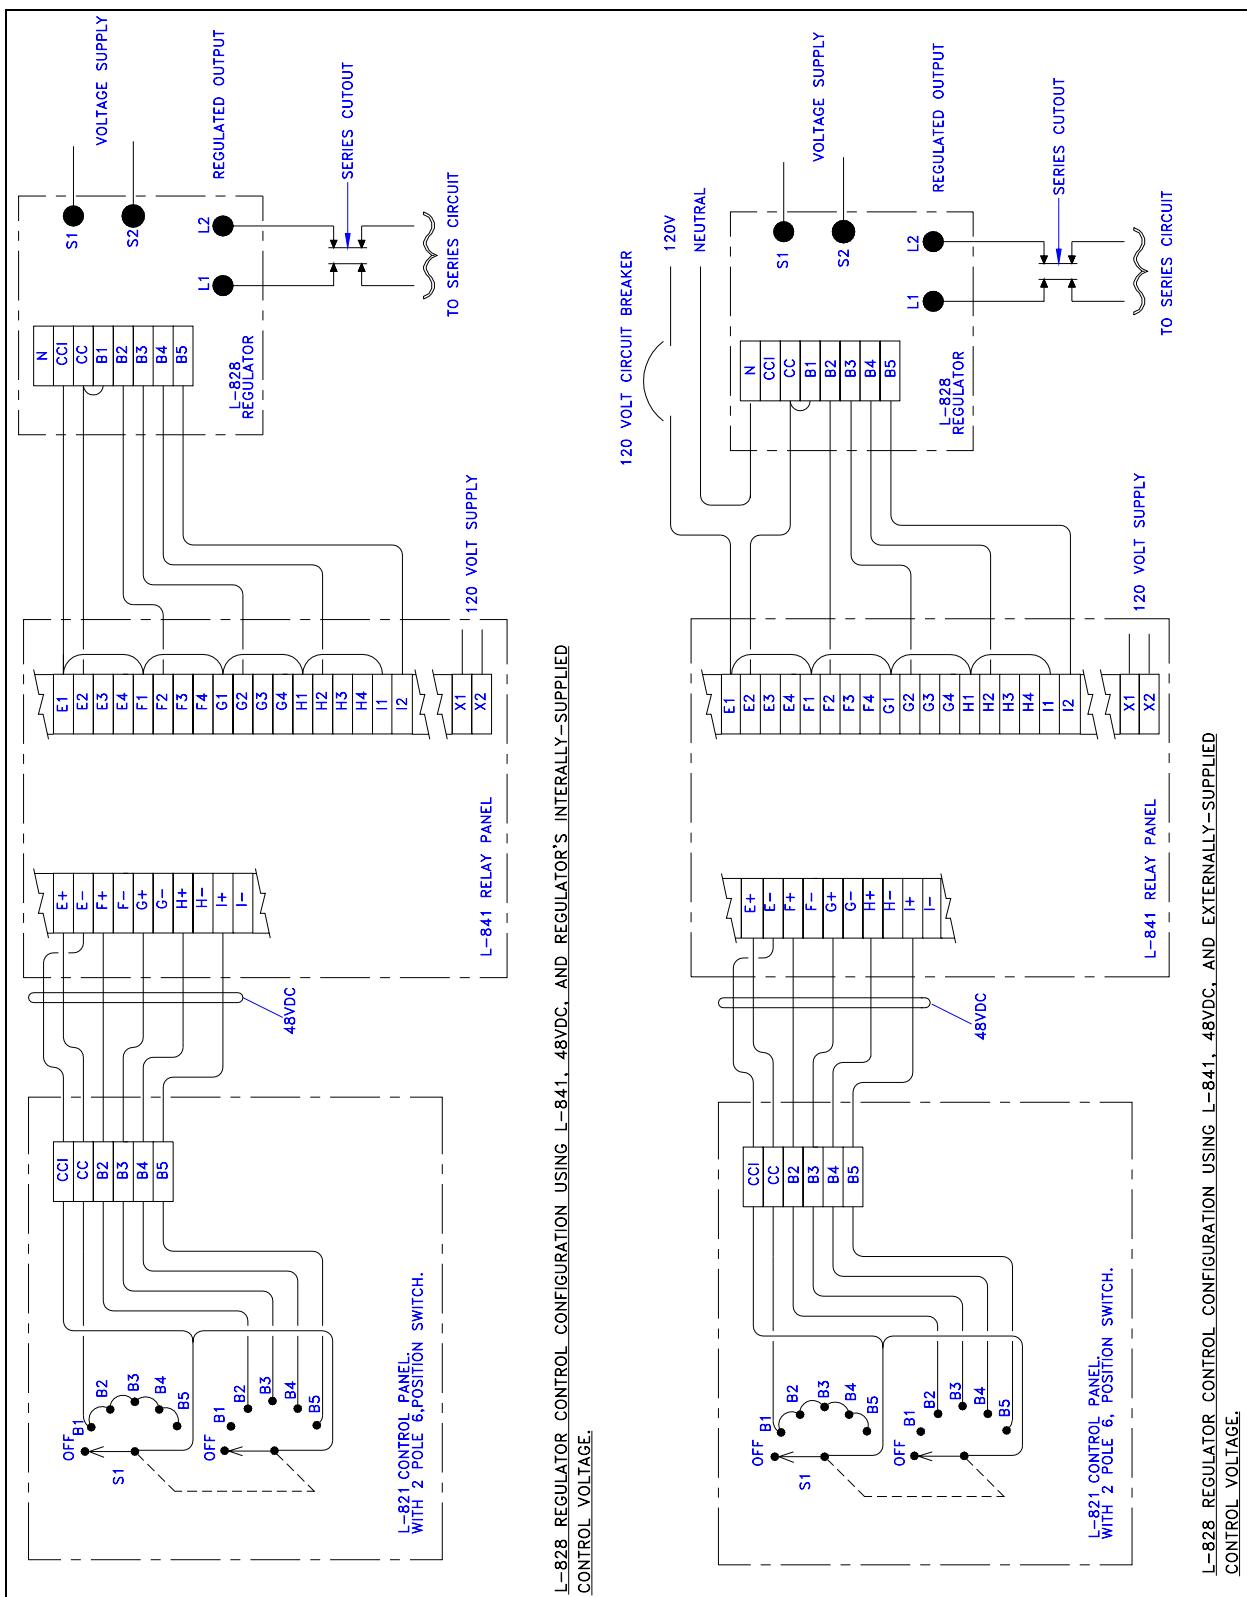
Typical 48 VDC Remote Control System with 5-Step Regulator and L-841 Relay Panel
